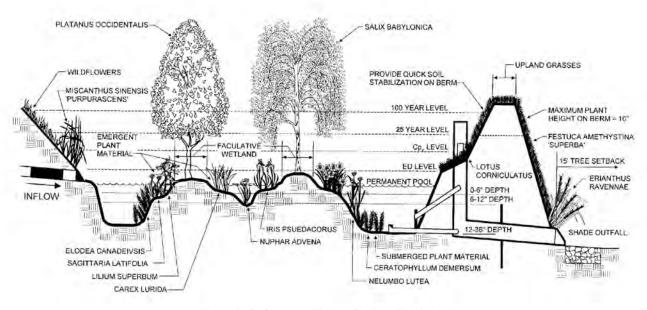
Legend of Hydrologic Zones Around Stormwater Facilities
